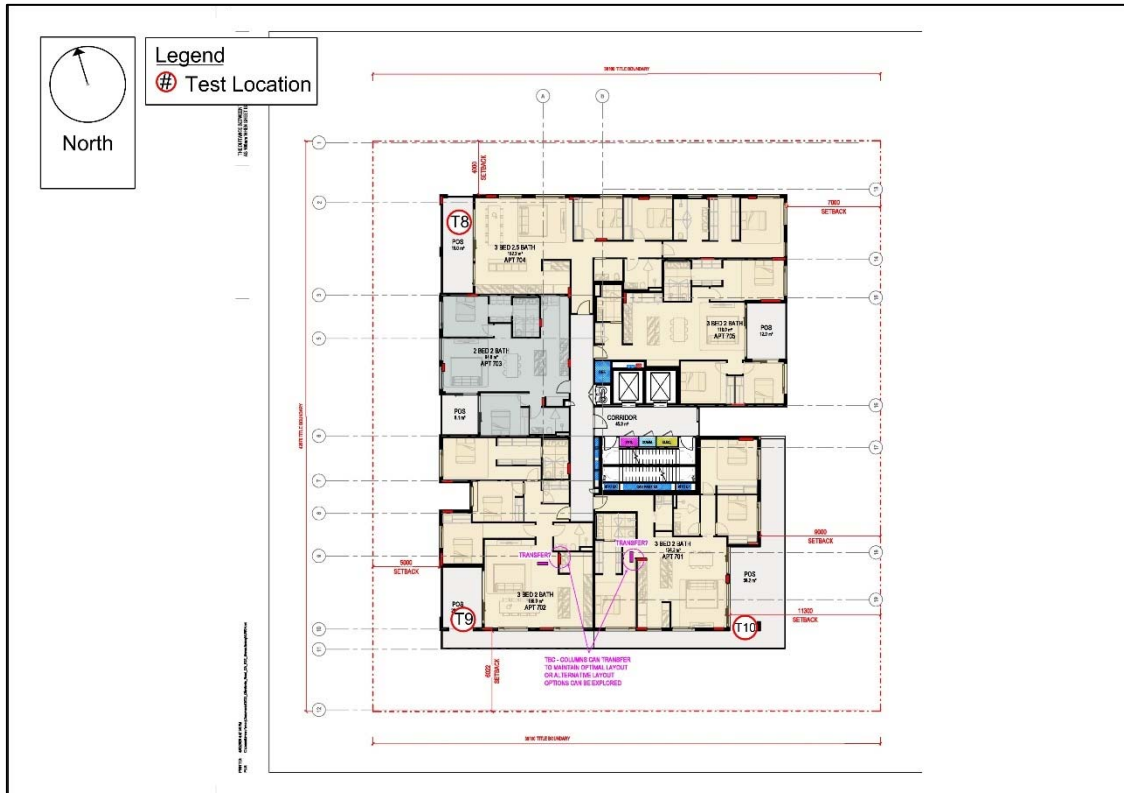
Test Locations on Level 7 of proposed 846-858 Glenferrie Road development.
